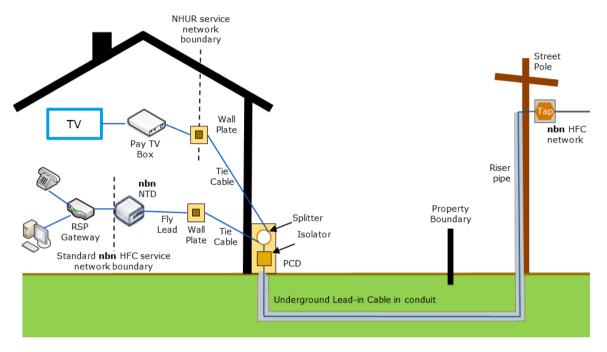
SDU nbn HFC installation – aerial TAP with underground lead-in cable
